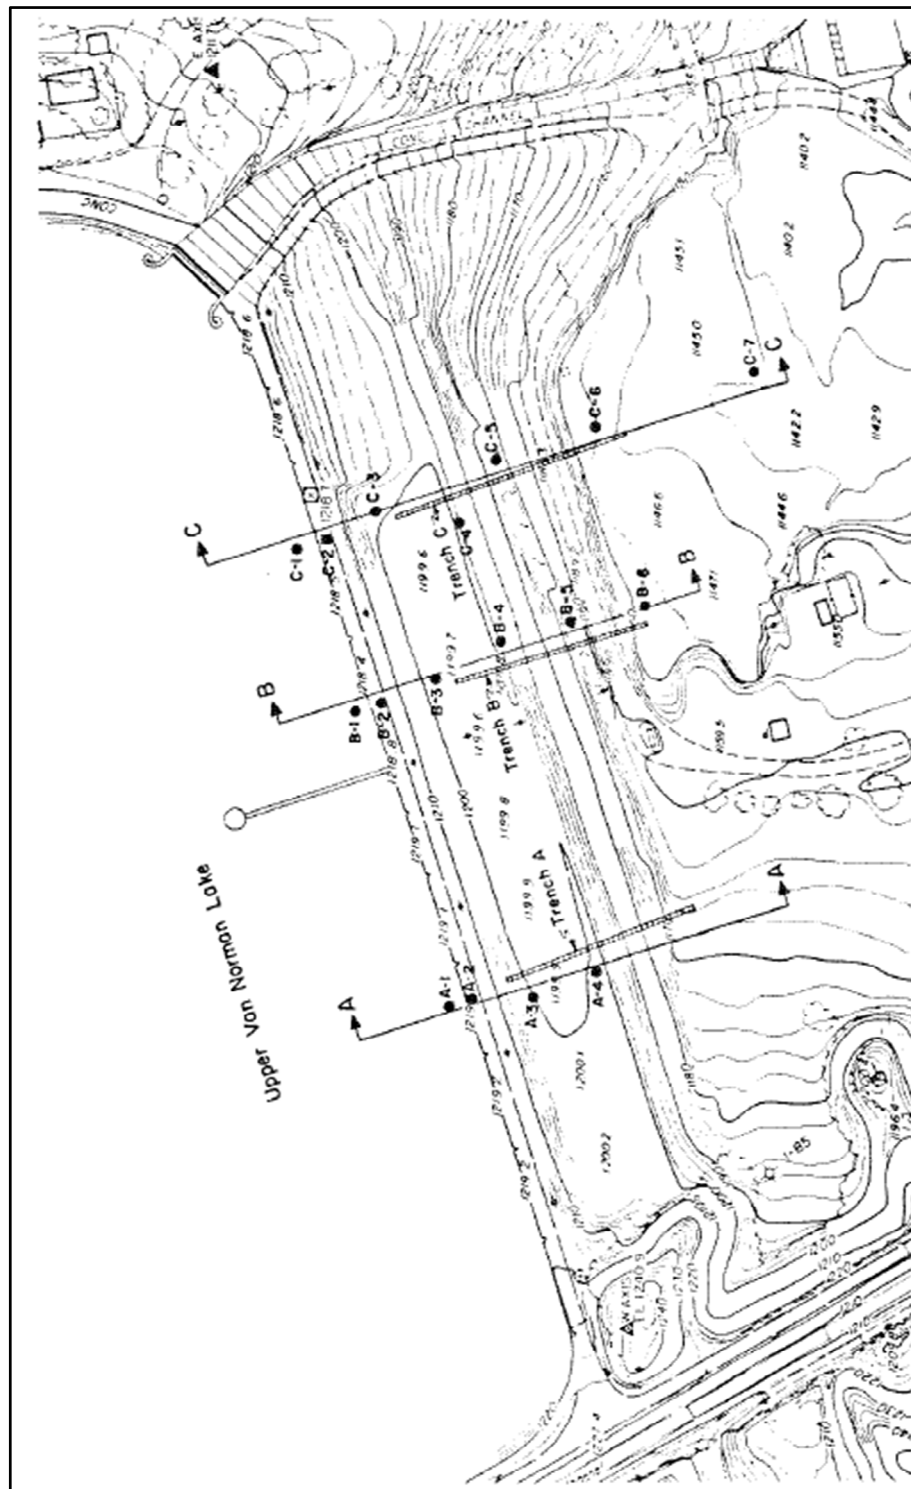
Plan view of the USFD showing cross-sections, borings, and trench locations from the post-earthquake study (Seed et al., 1973)
